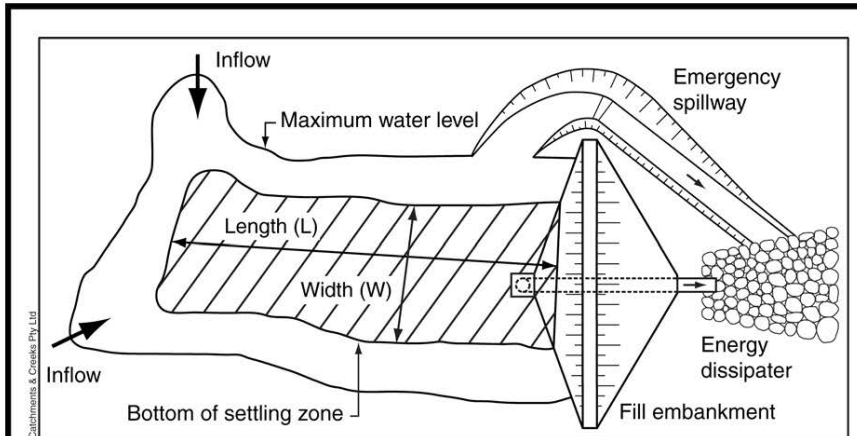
Type C sediment basin with riser pipe outlet (plan view)
